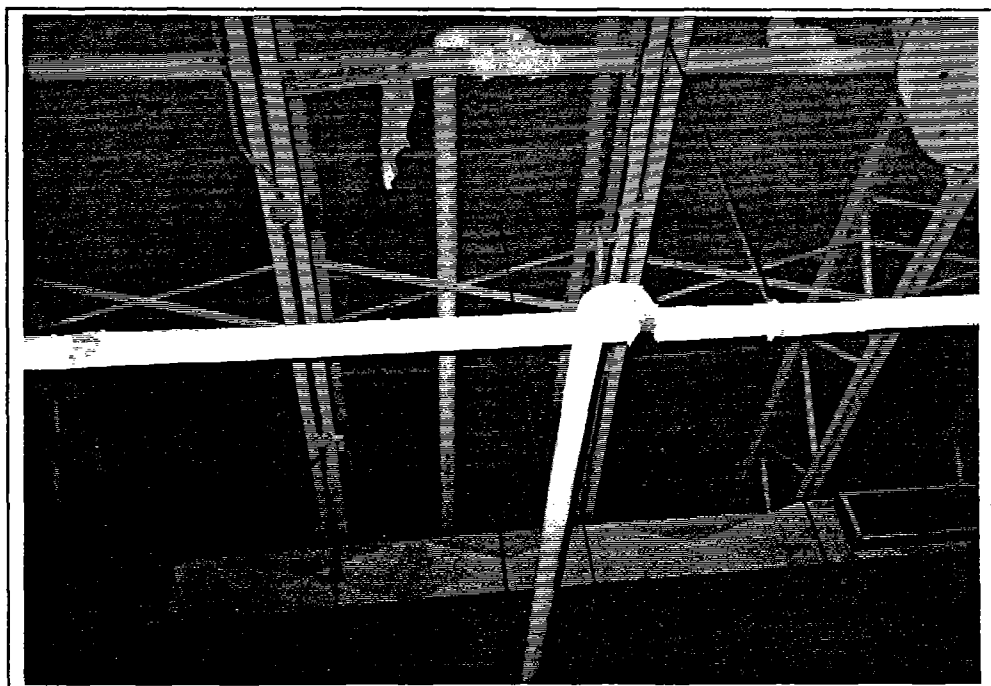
Building 41 - Hot water distribution piping where Sample No. 1-027 was taken. Sample analyzed negative for asbestos.
